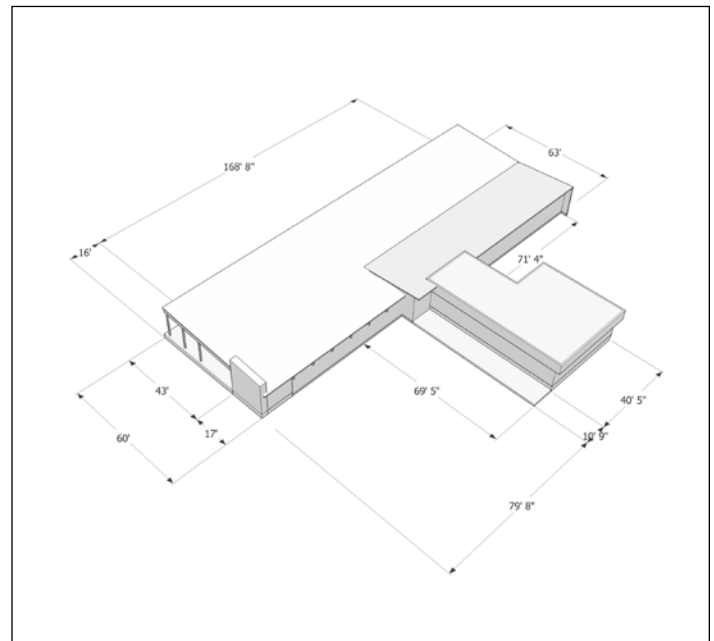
Plan-view of the Old Kake Elementary School with measurements. Shaded areas are additions (© Olberding White Architects 2014).
